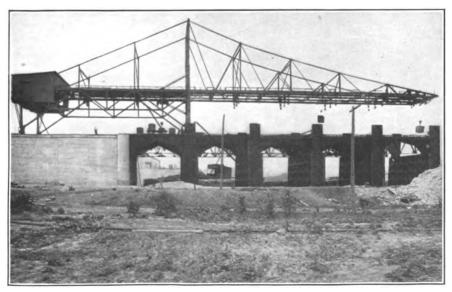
Fig. B.—Keokuk dam, showing traveler for placing steel forms and concrete.
